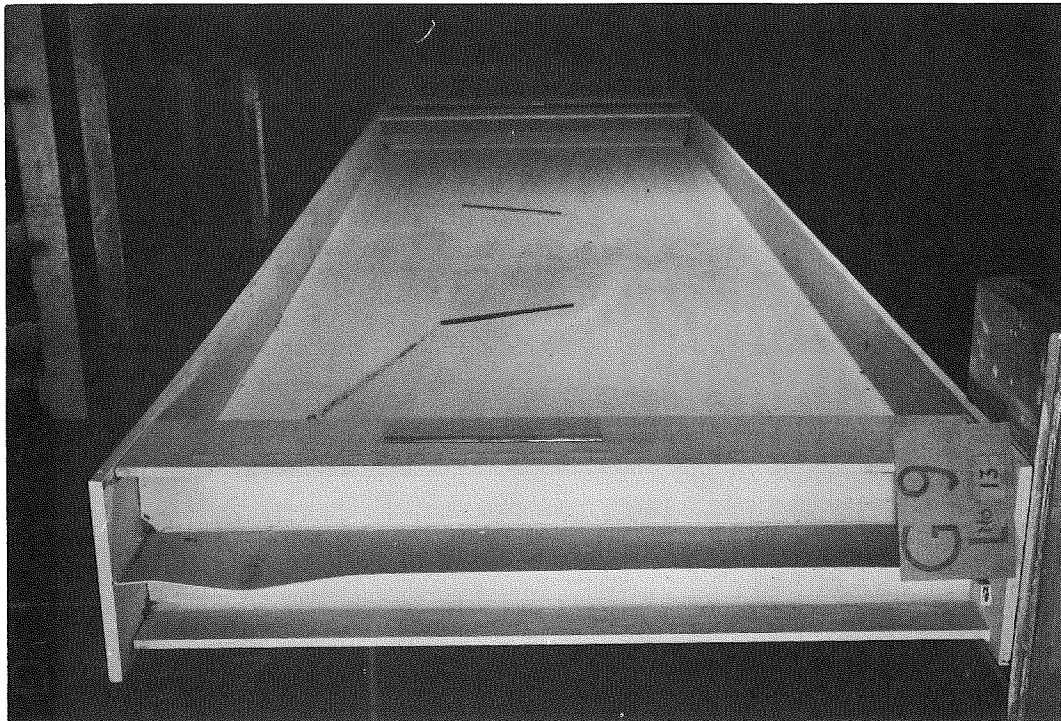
Appearance of Girder End, Girder G9, Test T1
